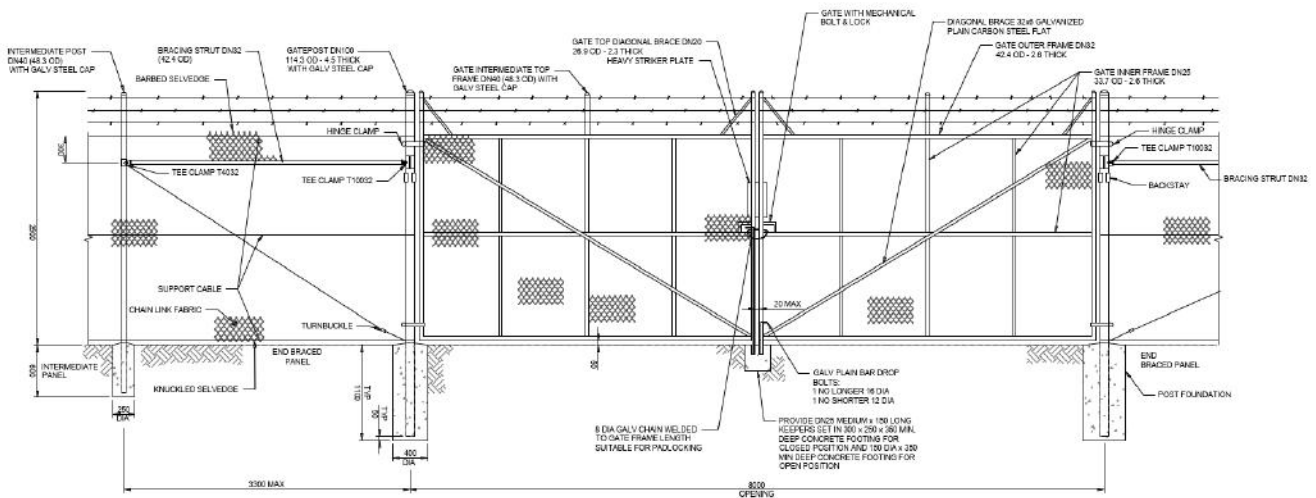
Current Proposal: Security fencing and gate elevation. Source: NG Electrical (plans dated 05.06.2020)
